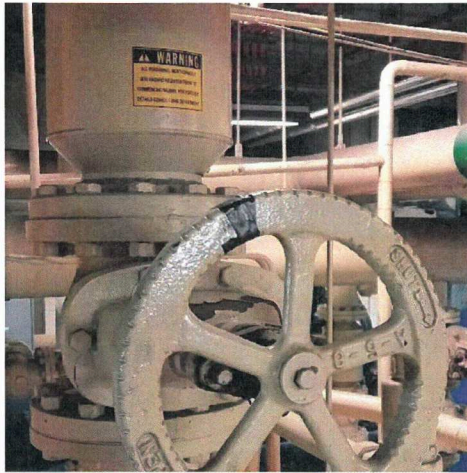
Level 23, Plant Room, Standby Pump 1, Hot Water Piping - Gasket
